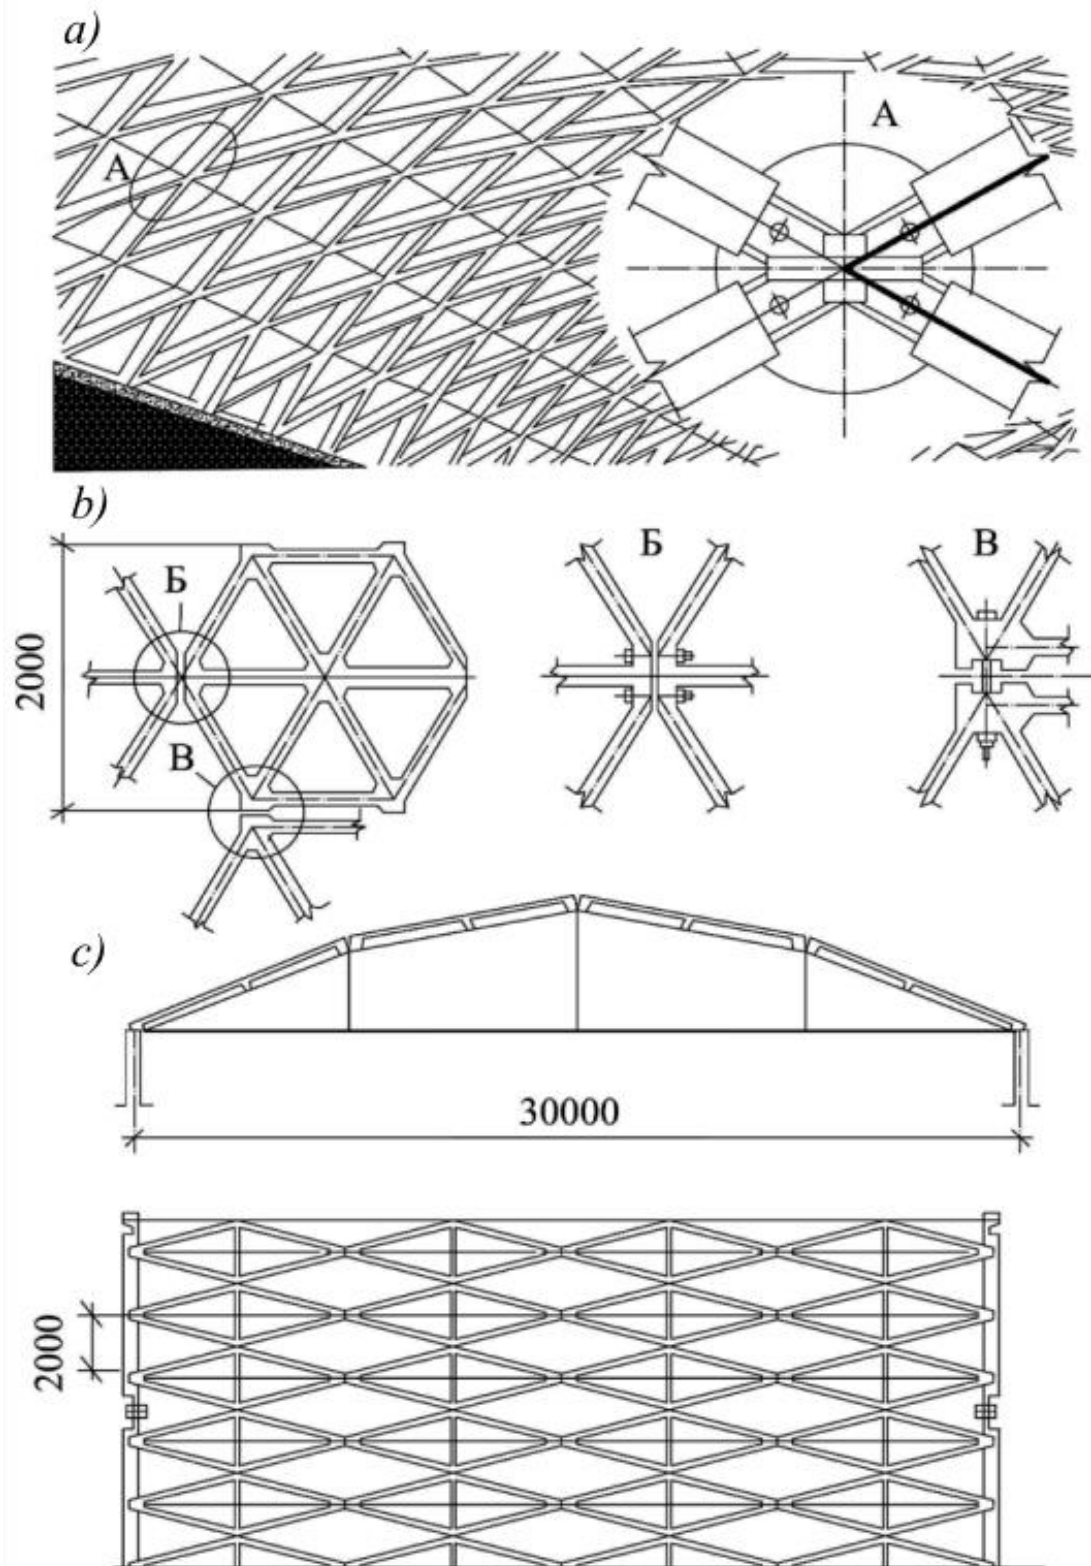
Prefabricated lattice vaults of reinforced concrete elements:
